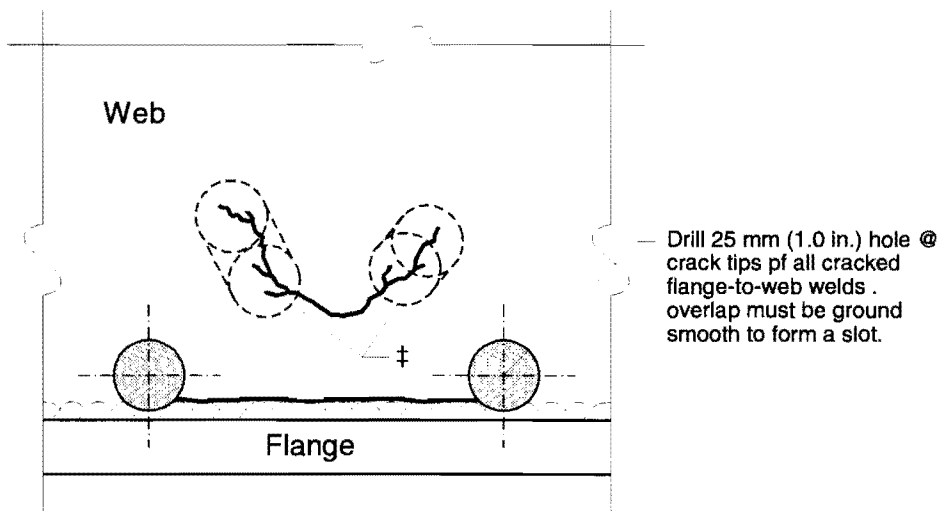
Front side (stiffener side) detail for Type 3 detail.
